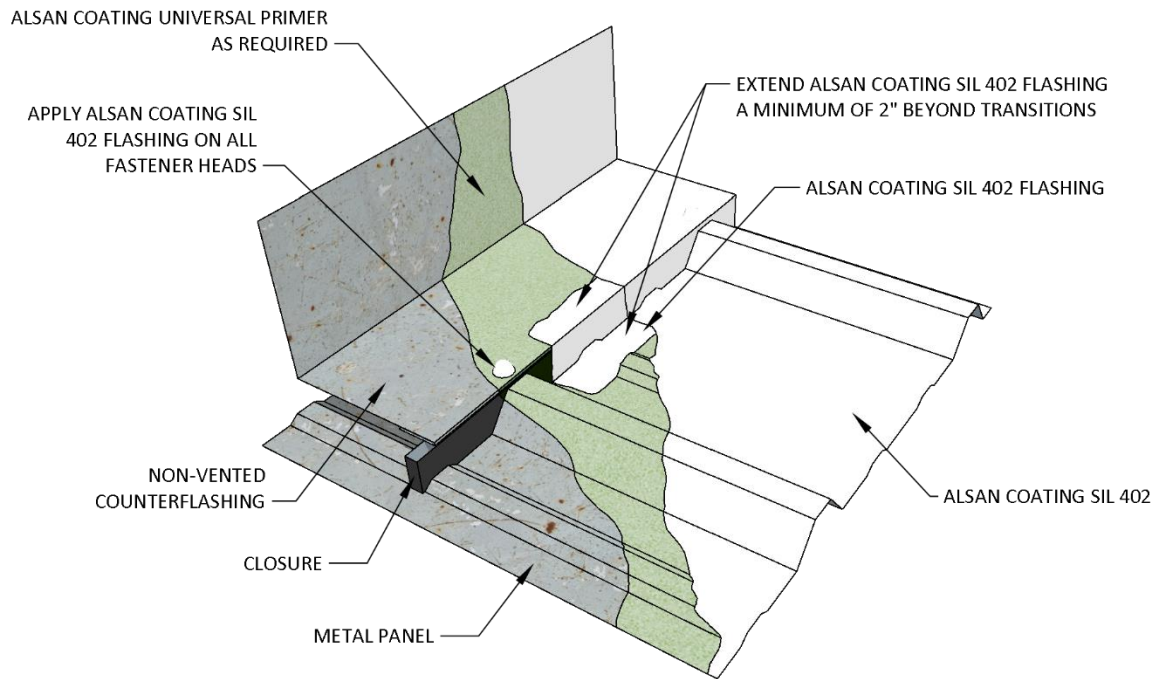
Silicone Roof Coating Over Metal Lap Panels, Wall/Curb
